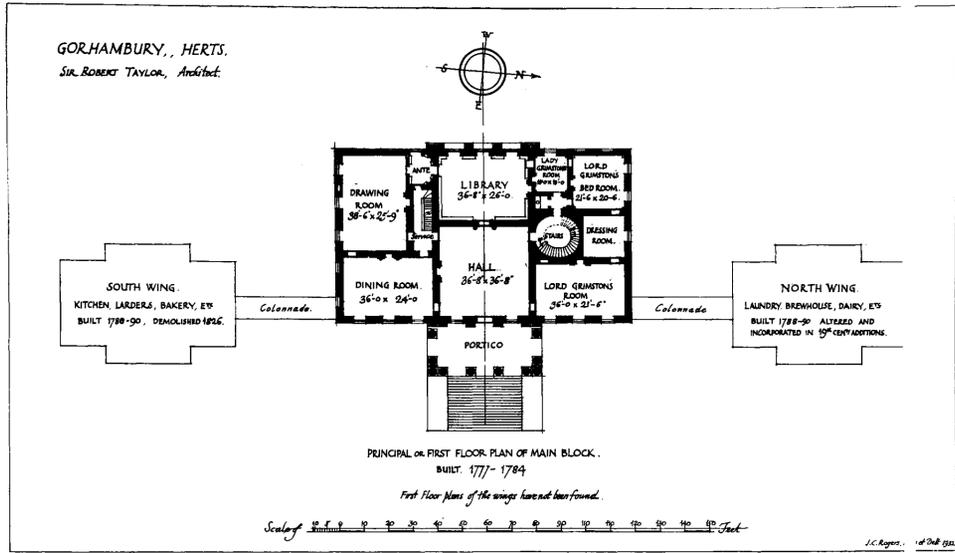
FIRST FLOOR PLAN AS IT WAS BEFORE THE LARGE ADDITIONAL WING OF NINETEENTH CENTURY DATES CLOSED THE WINDOWS ON THE NORTH WALL AND INCORPORATED THE ORIGINAL NORTH DETACHED WING.
